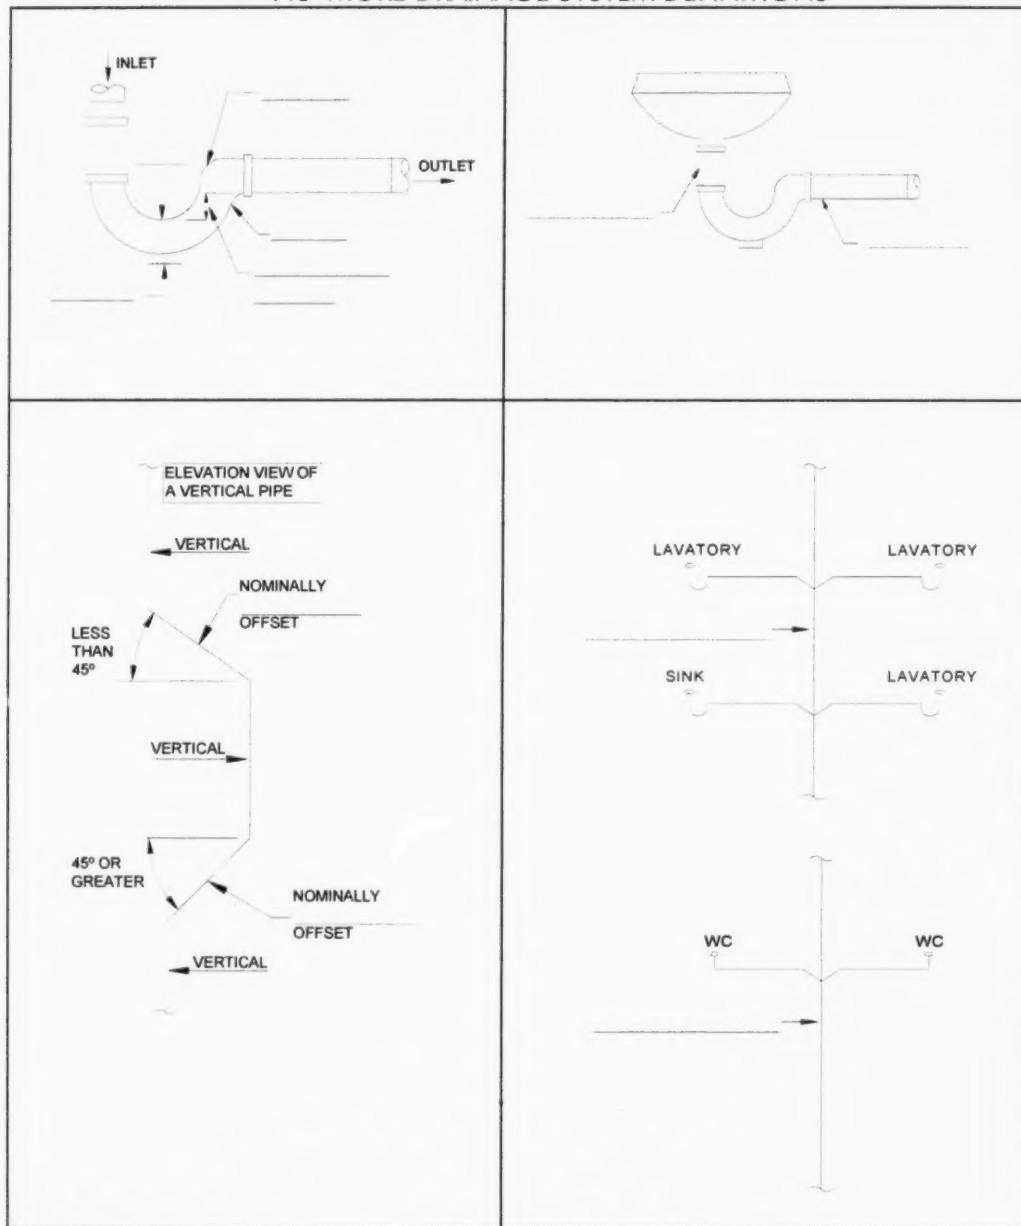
2 DRAINAGE SYSTEM DEFINITIONS
